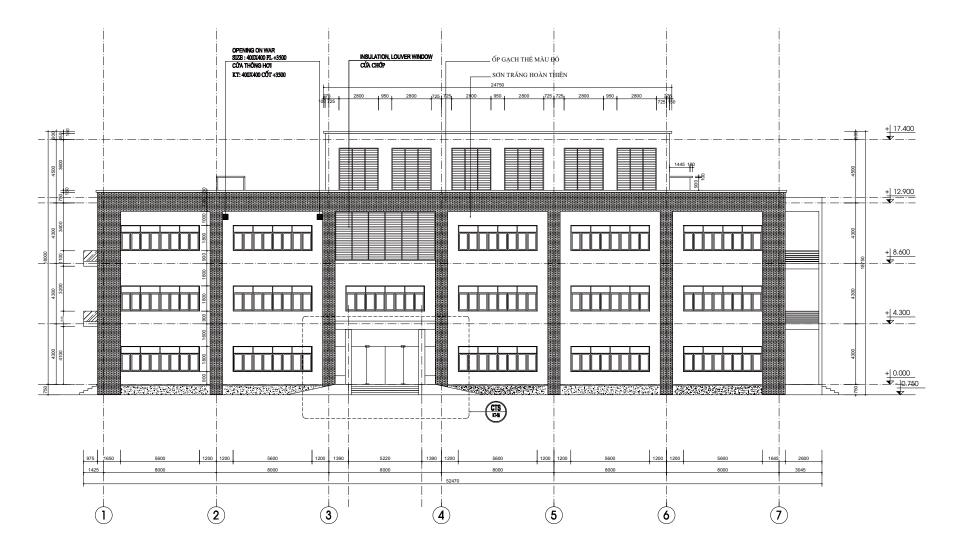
RETAQ center Reference Test Building: Elevation plan
